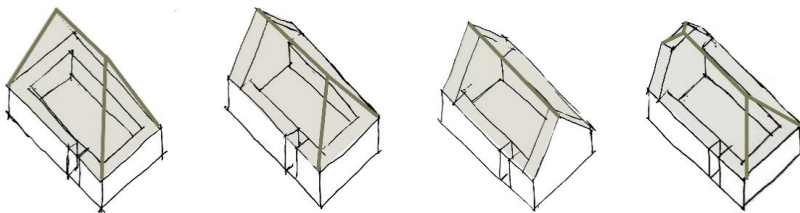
Variants of *gladas*’ walls: a leveled sidewall, one gable wall, two gable walls and a half-gable wall drawing: A. Kapetanović.
